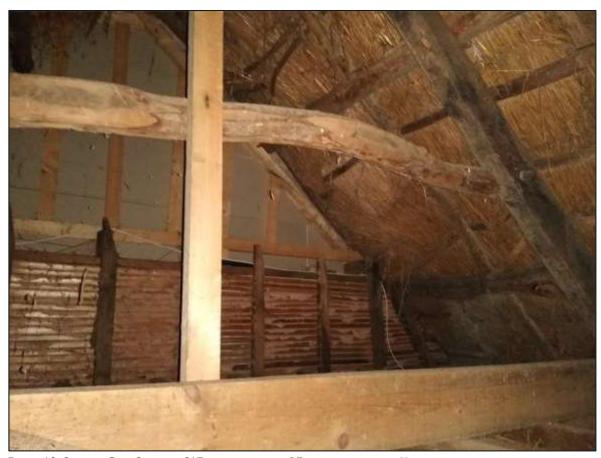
CHALLICE GATE COTTAGE: C17 ROOF TRUSS OVER R7, FROM SOUTH-EAST. NOTE SMOKE STAINED NORTH TRUSS BLADE AND CLEAN WANEY SINGLE-PEGGED COLLAR. C19 LATH AND PLASTER PARTITION TO HONEY COTTAGE RE-USES OLDER TIMBERS, SOME SMOKE-STAINED.
